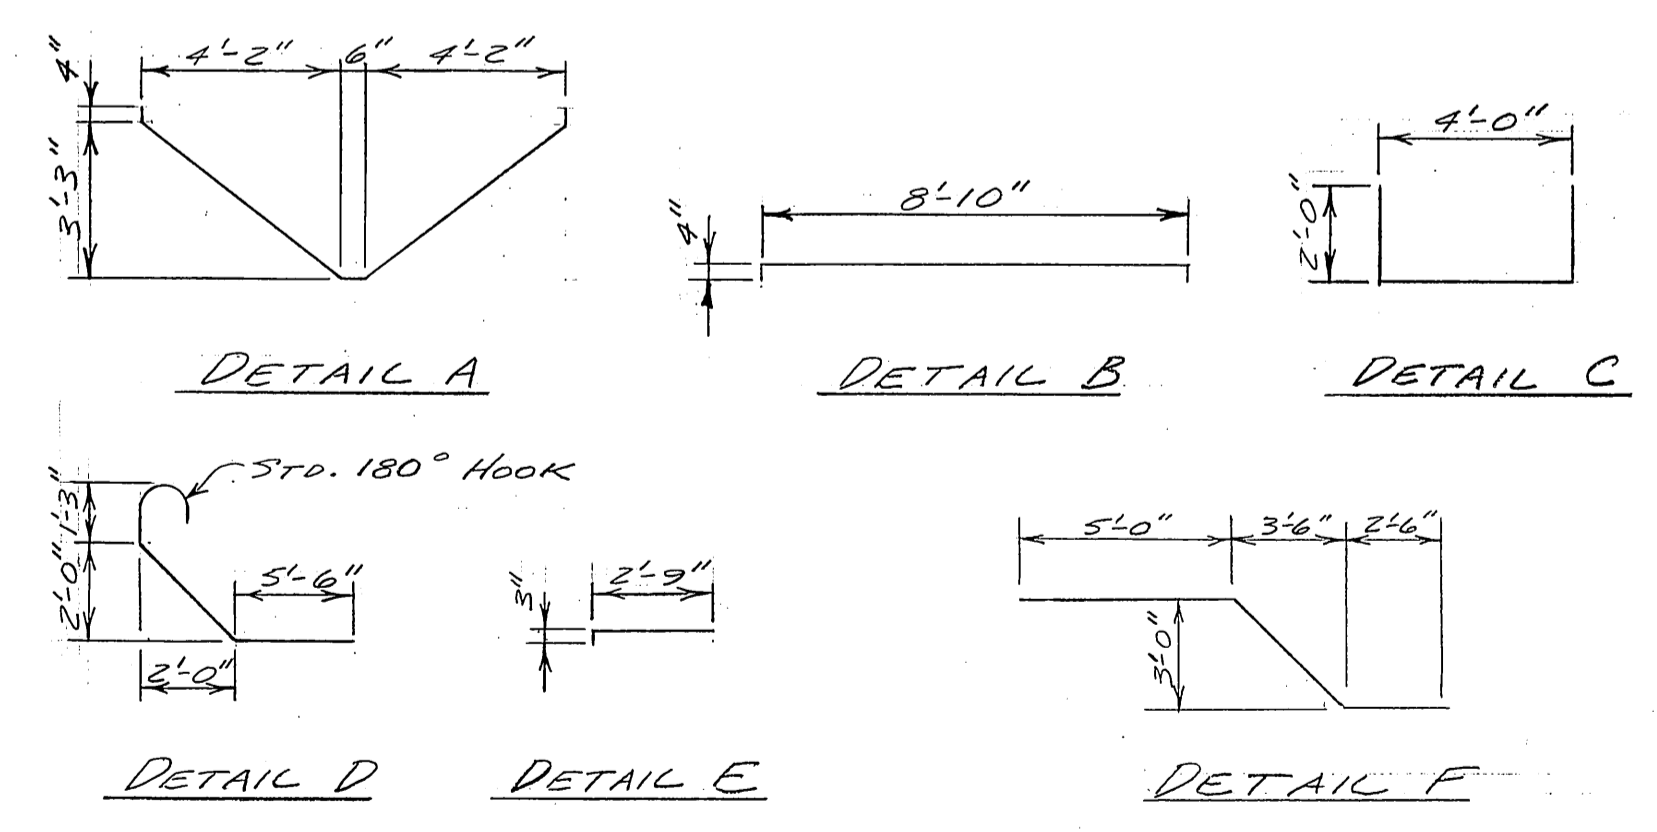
DETAILS - TRANSVERSE CONSTRUCTION JOINT
